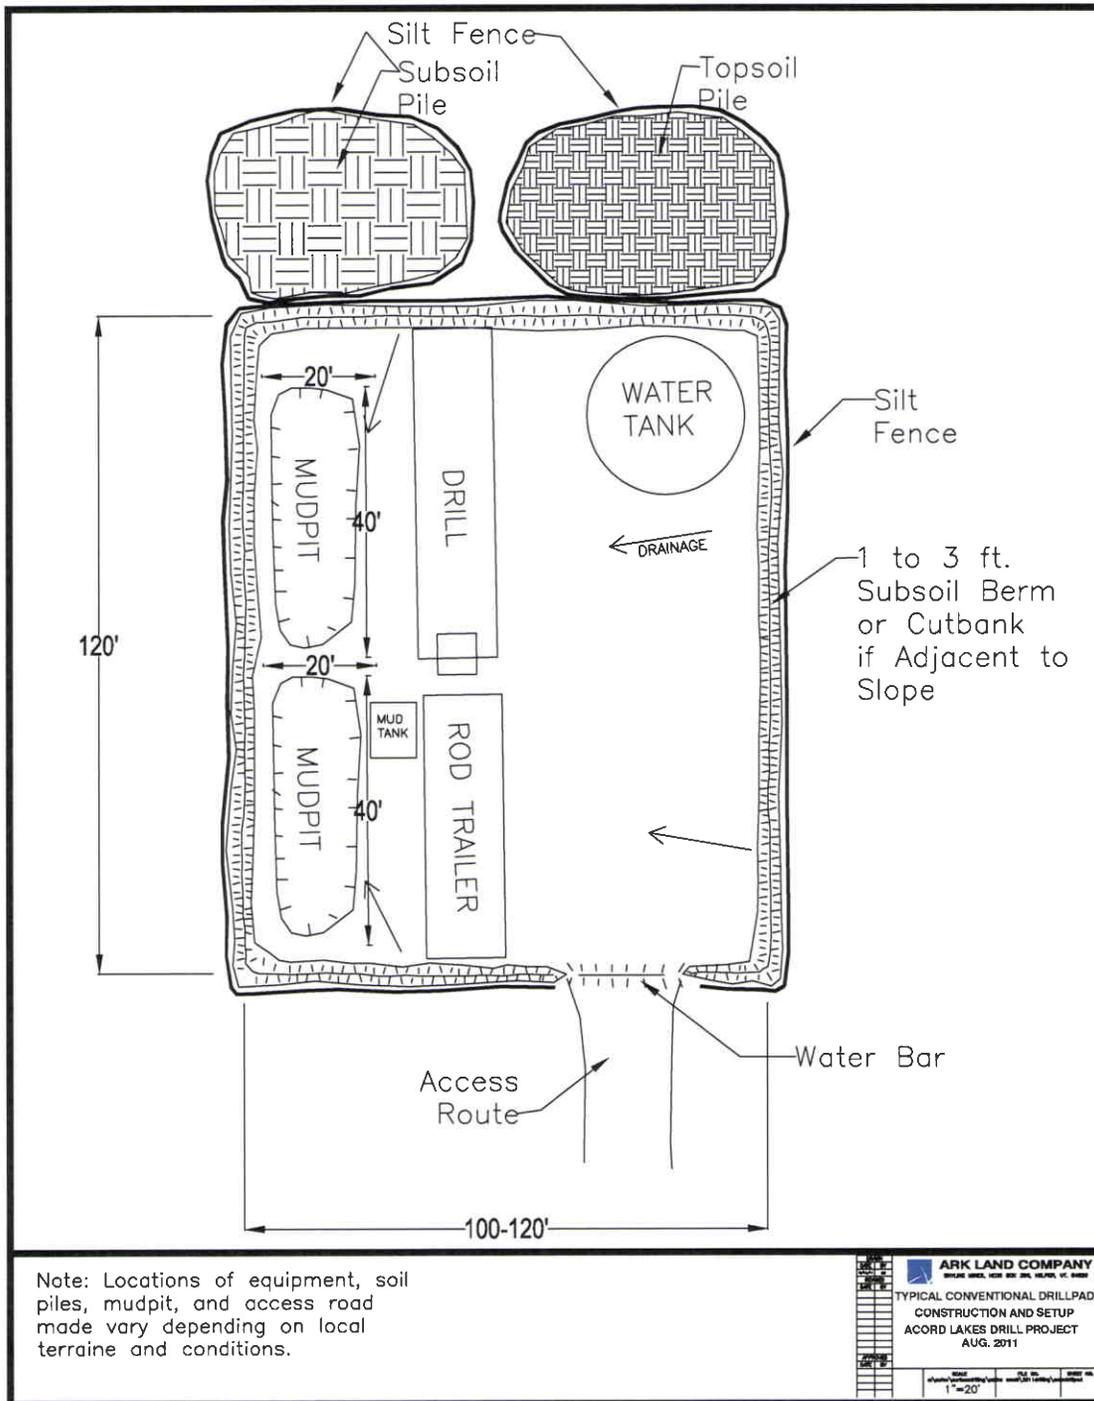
Typical conventional drillsite setup. Note: Site UCP-B will be drilled on a pre-existing gravel pad. There is no topsoil. The berm will be constructed of excavated mudpit material or imported material.
